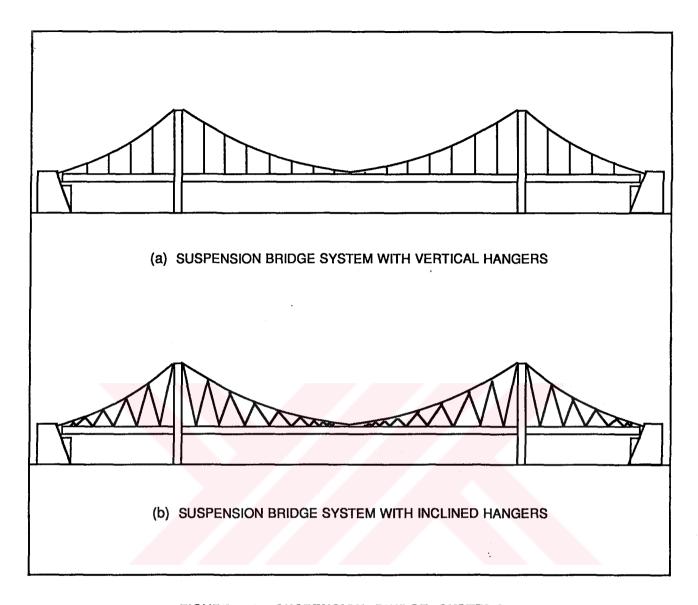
SUSPENSION BRIDGE SYSTEMS
